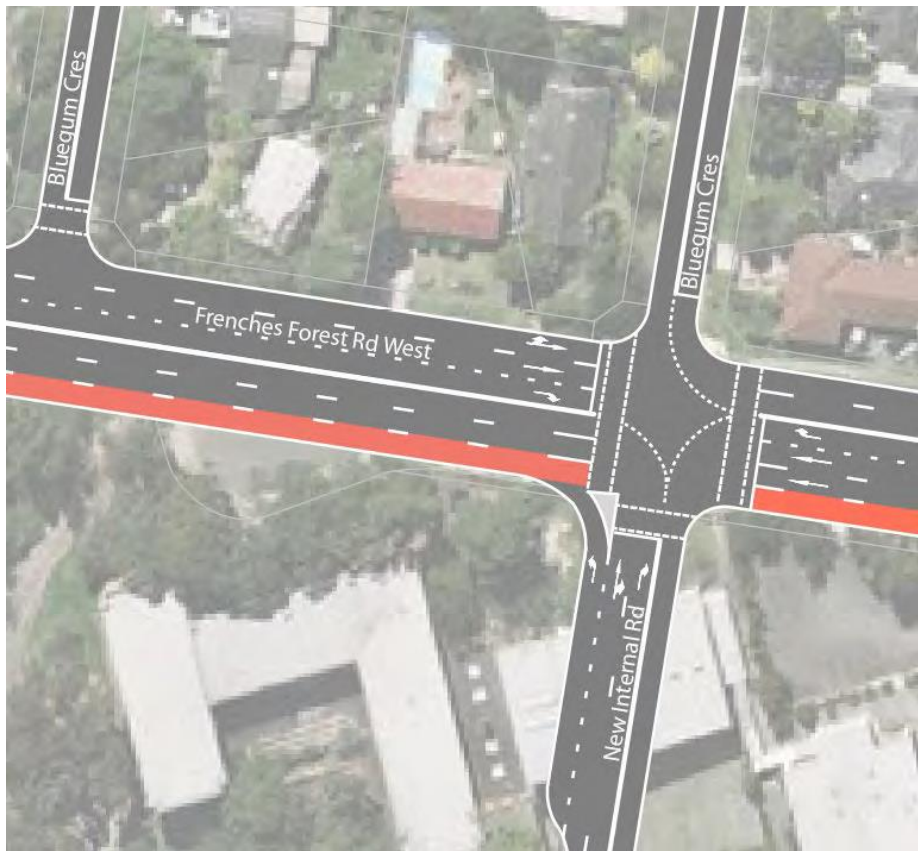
Frenchs Forest Road West/ Bluegum Crescent/ New Internal Road
